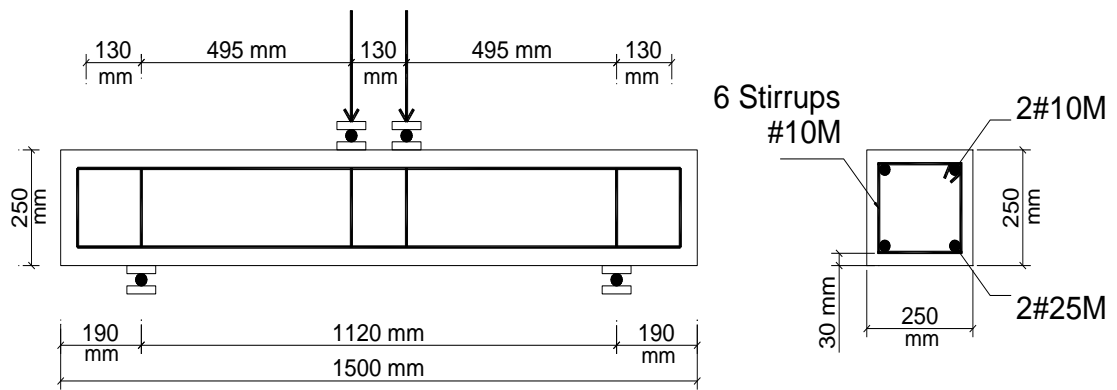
Typical test setup, dimensions, and reinforcement of tested beams in shear
